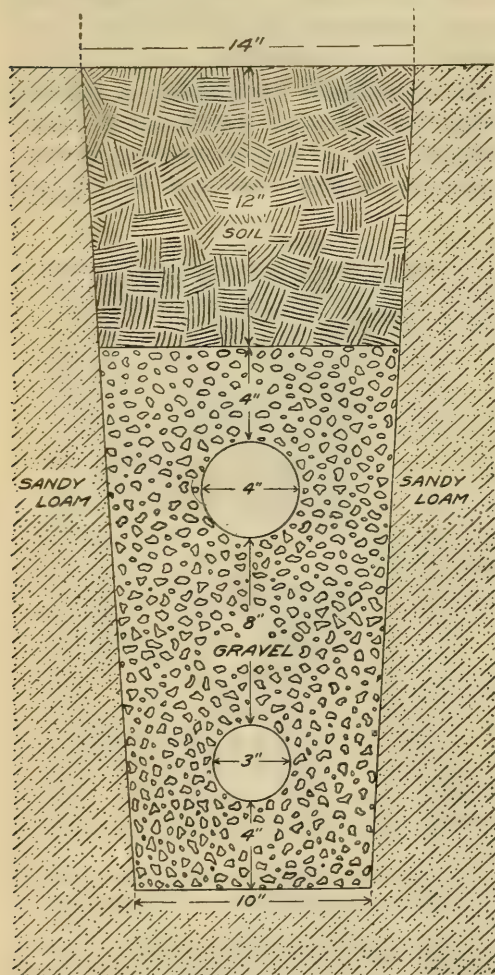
Cross section of single tile sewage disposal system, showing second tile below for underdrainage.
